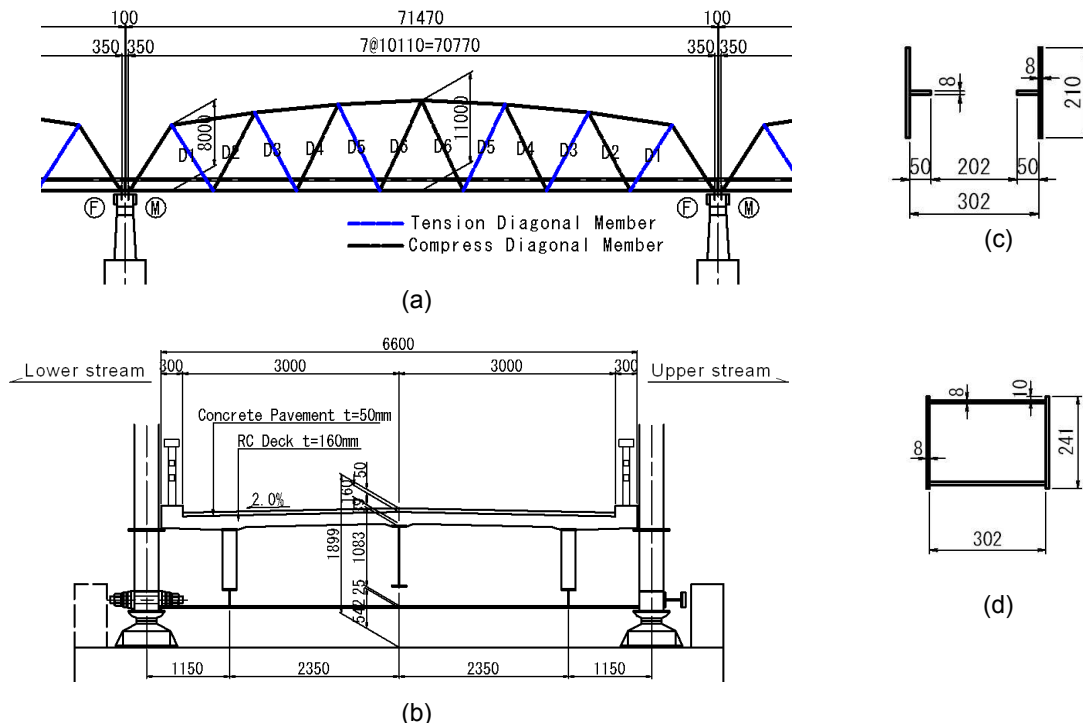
Steel truss bridge investigated: (a) side view of single span, (b) cross section of the bridge, (c) cross section of tension diagonal member, (d) cross section of compression diagonal member. Unit [mm].
